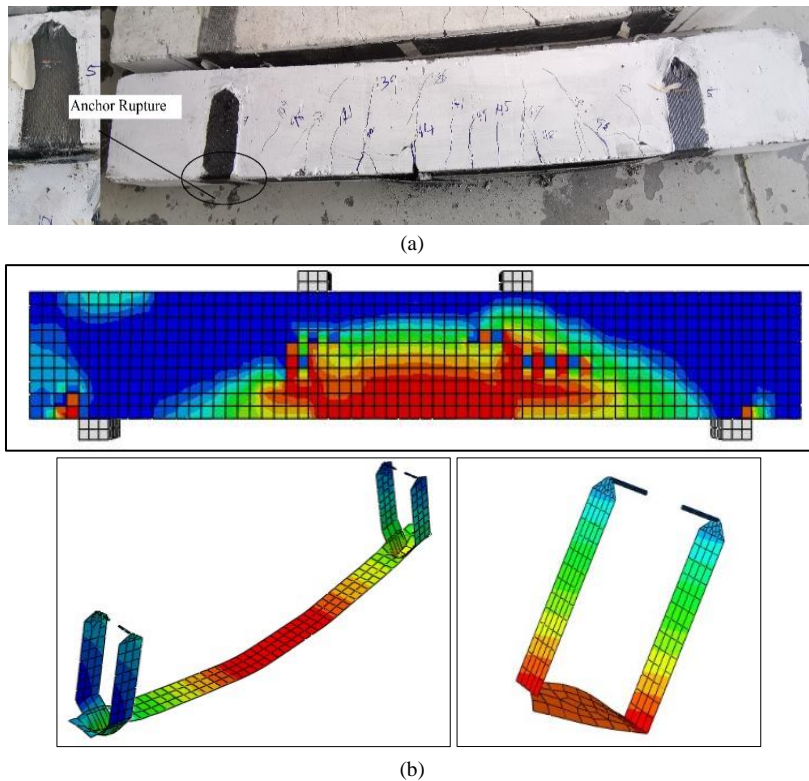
(a) Failure mode in Specimen CE - Concrete cover Separation failure, (b) Failure mode in Specimen FE-CE – Plate End debonding
